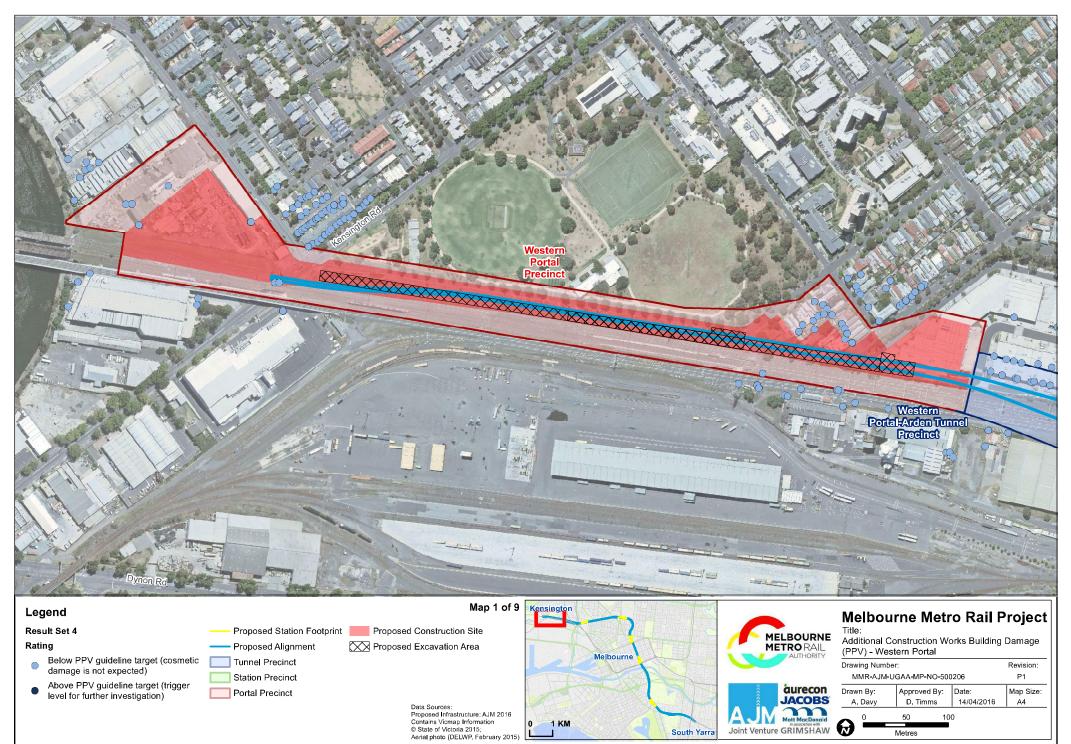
Colour coded building damage assessment due to Additional Construction Works – Western Portal Precinct
